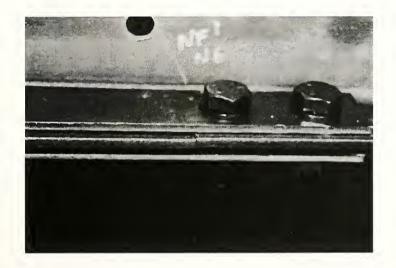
Drilled Web Hole at Crack Tip - Specimen NF1 North End.
